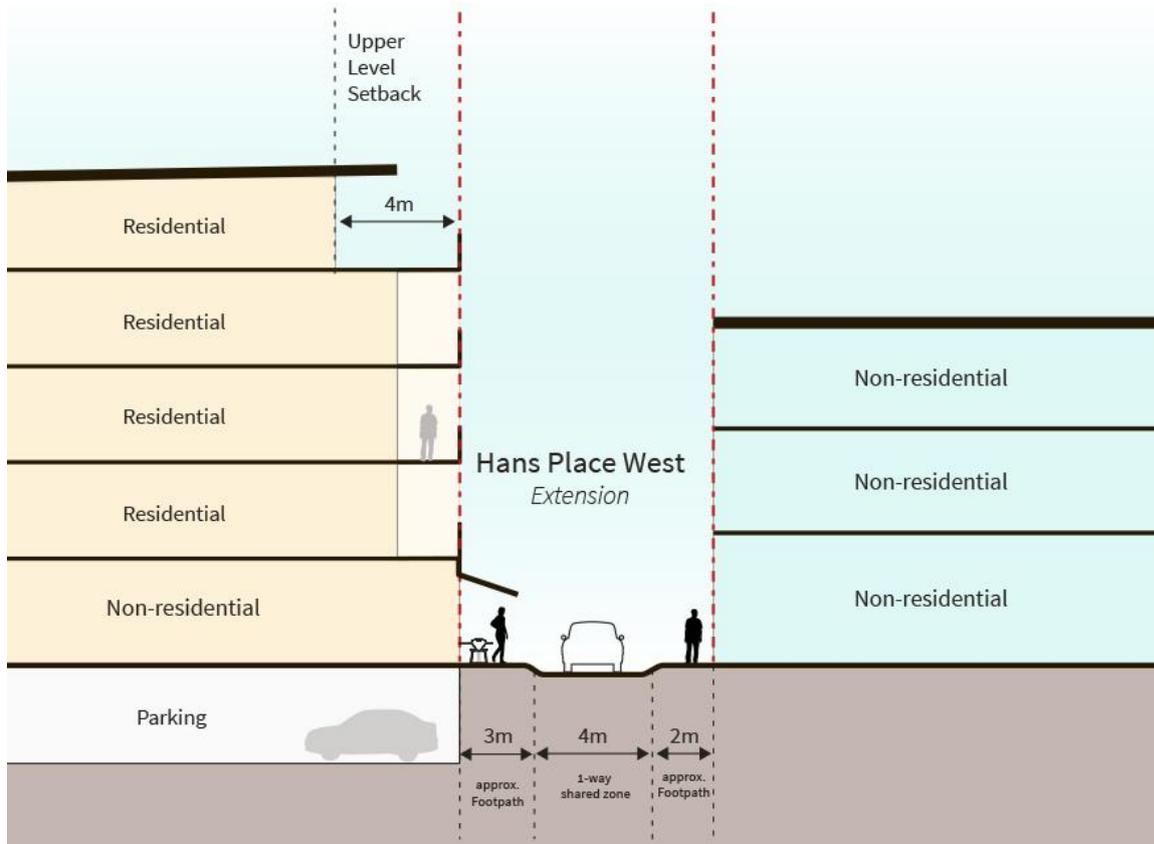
Street section 7 – Road extension of Hans Place West (Shared zone)
